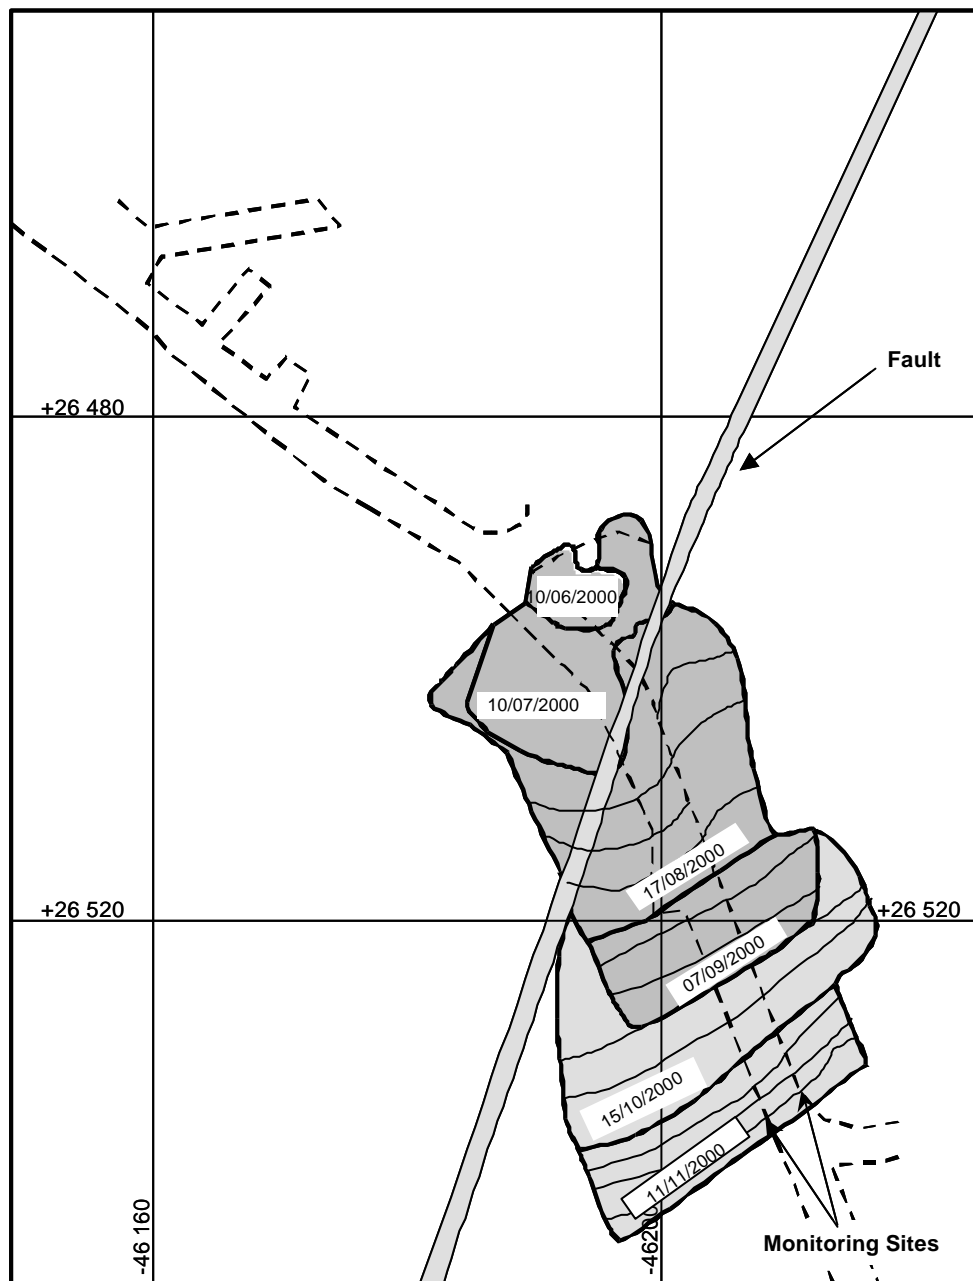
A plan view of the monitoring site and de-stressing slot.
